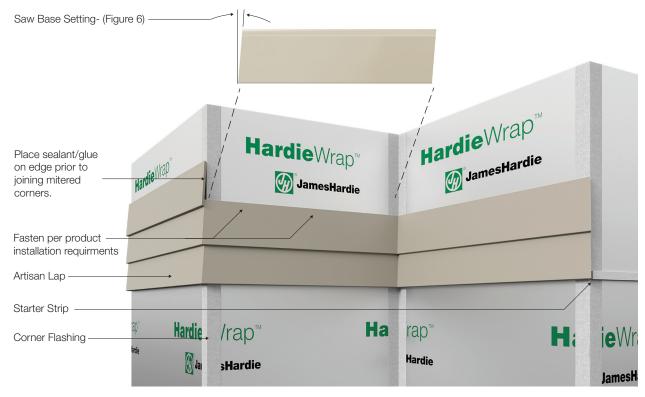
Artisan Lap siding installation with mitered internal and external corners.
